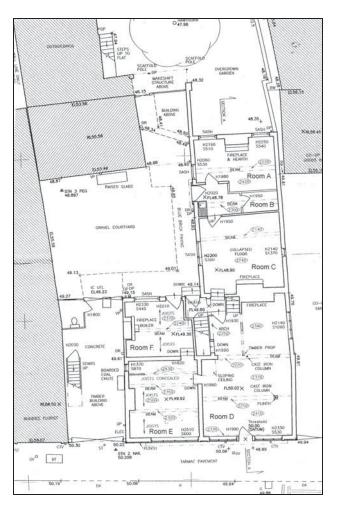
Ground Floor plan (with letters A-F identifying rooms).
